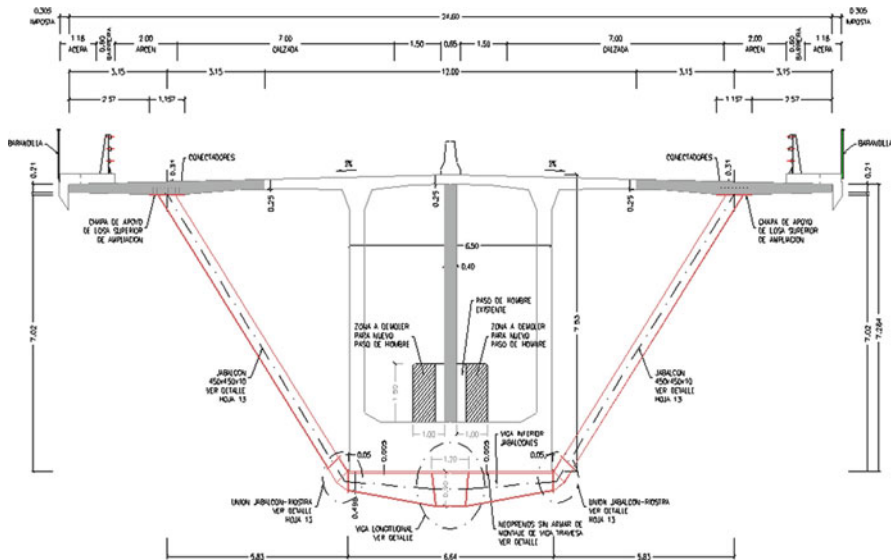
Transverse section of the widened box from 12.0 to 24.0 m
